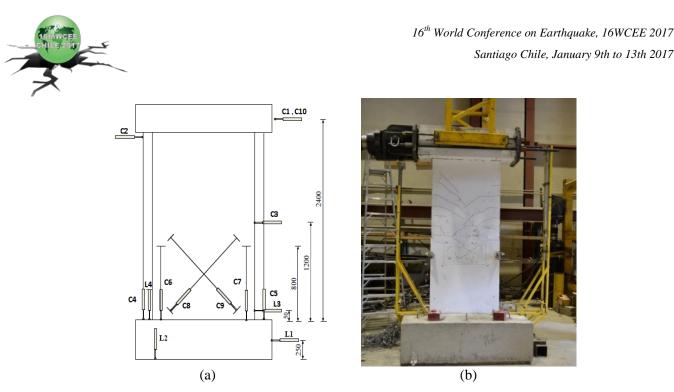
DCTs and LVDTs layout: (a) Schematic drawing (modified from Abdulridha [1]), and (b) Photo
